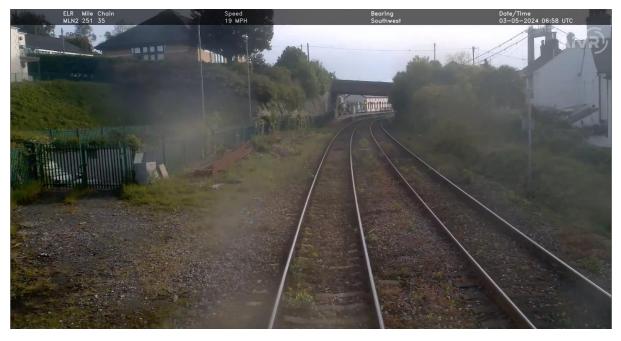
Overview of the site of the proposed platform extension, showing maintenance access compound and retaining wall.
